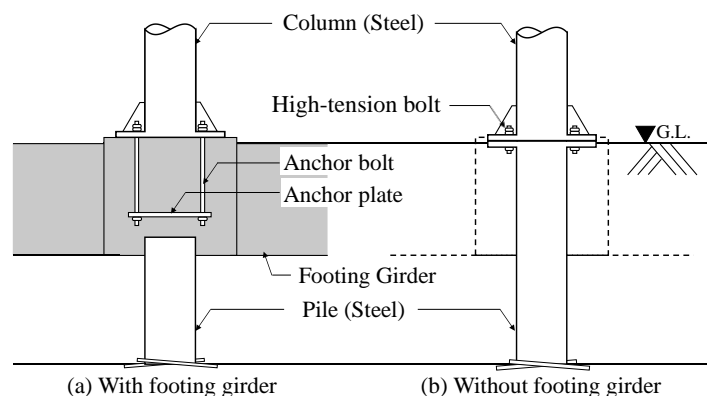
Detail of a pile-column joint and location of the expansion joint
